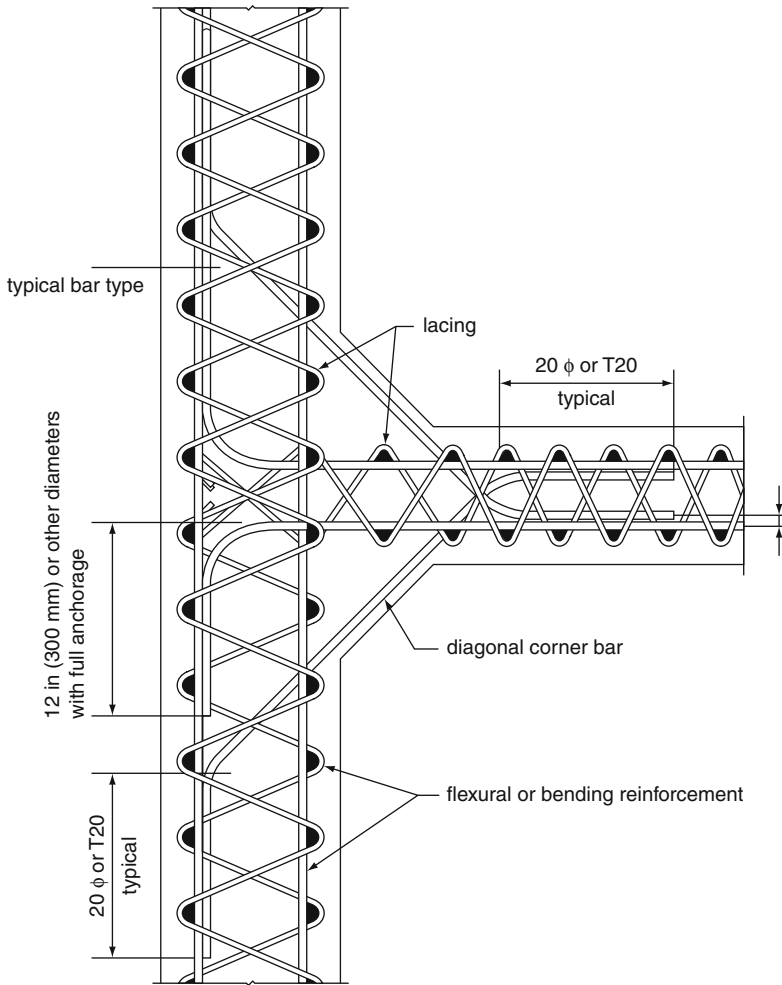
Typical detail at intersection of continuous and discontinuous walls
